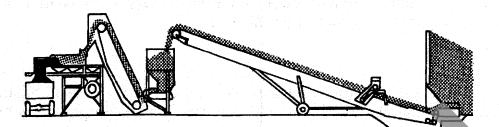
Flow diagram of a typical cold mix continuous plant.⁽³⁷⁾
